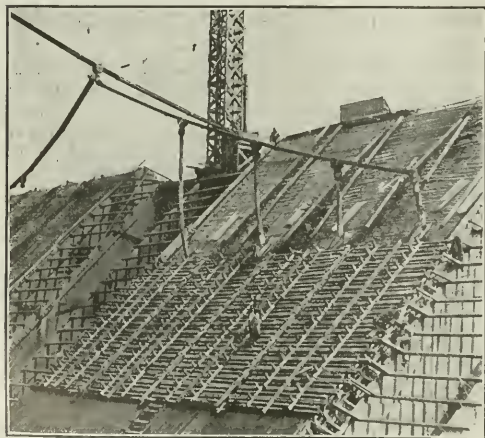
CHUTE ARRANGEMENT FOR CONCRETING DECK SLAB
